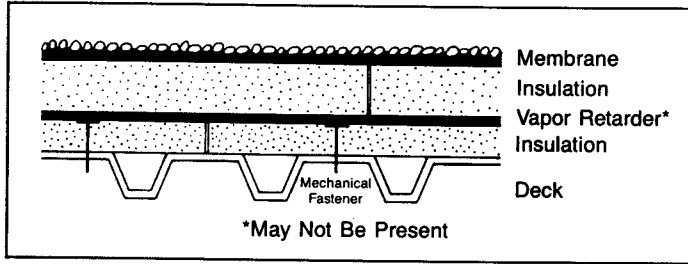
Cross-section of a compact membrane roofing system with the vapor retarder installed between insulation layers
